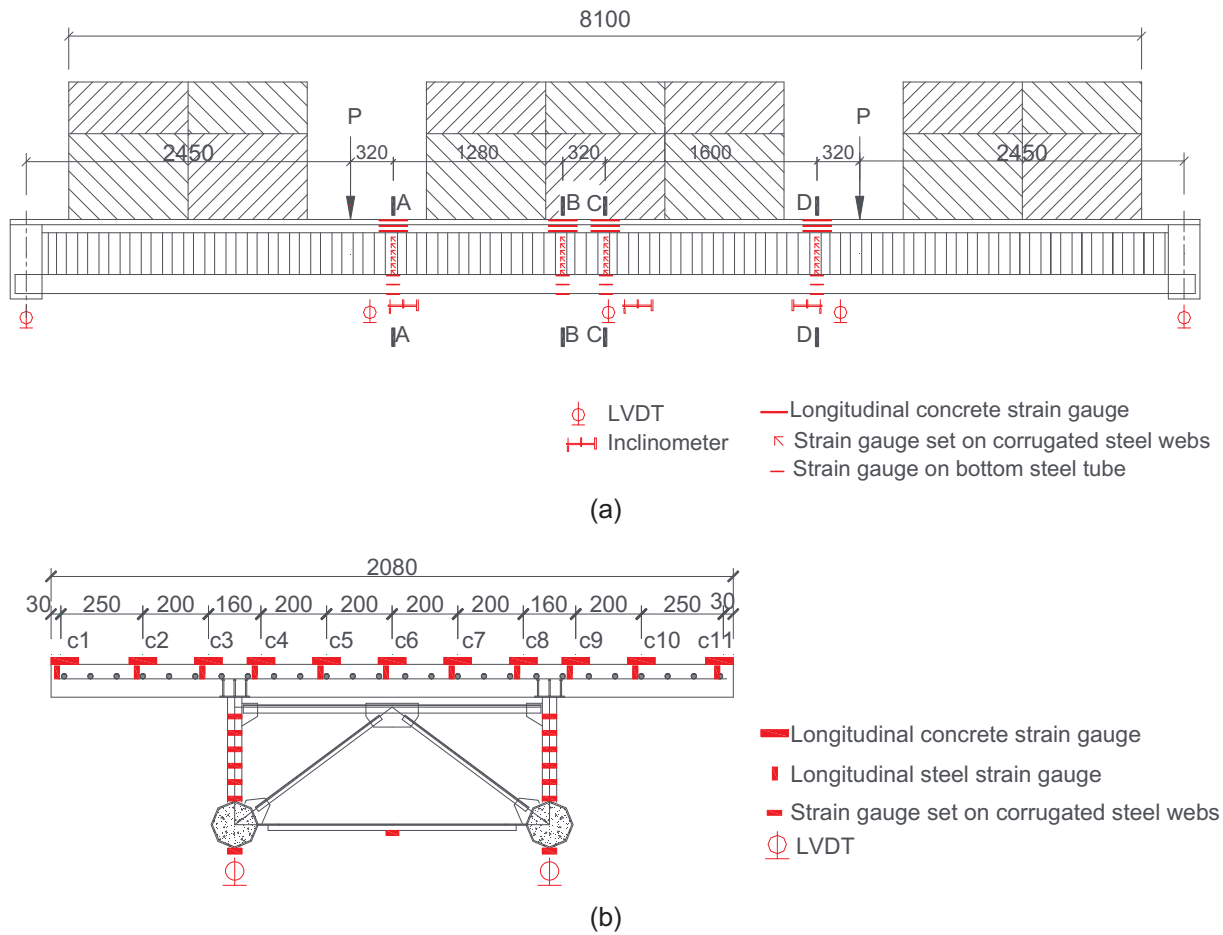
Loading set up and instrumentation of the test beam (Unit: mm): (a) side view; (b) typical cross-section.
